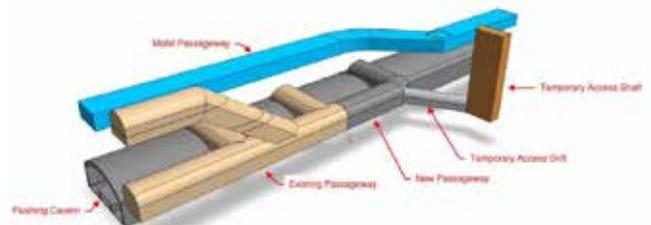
3-D Rendition of the New Passageway with Existing Subway Structure; shows the project location underground in relation to the mentioned connection points within the existing subway structures
